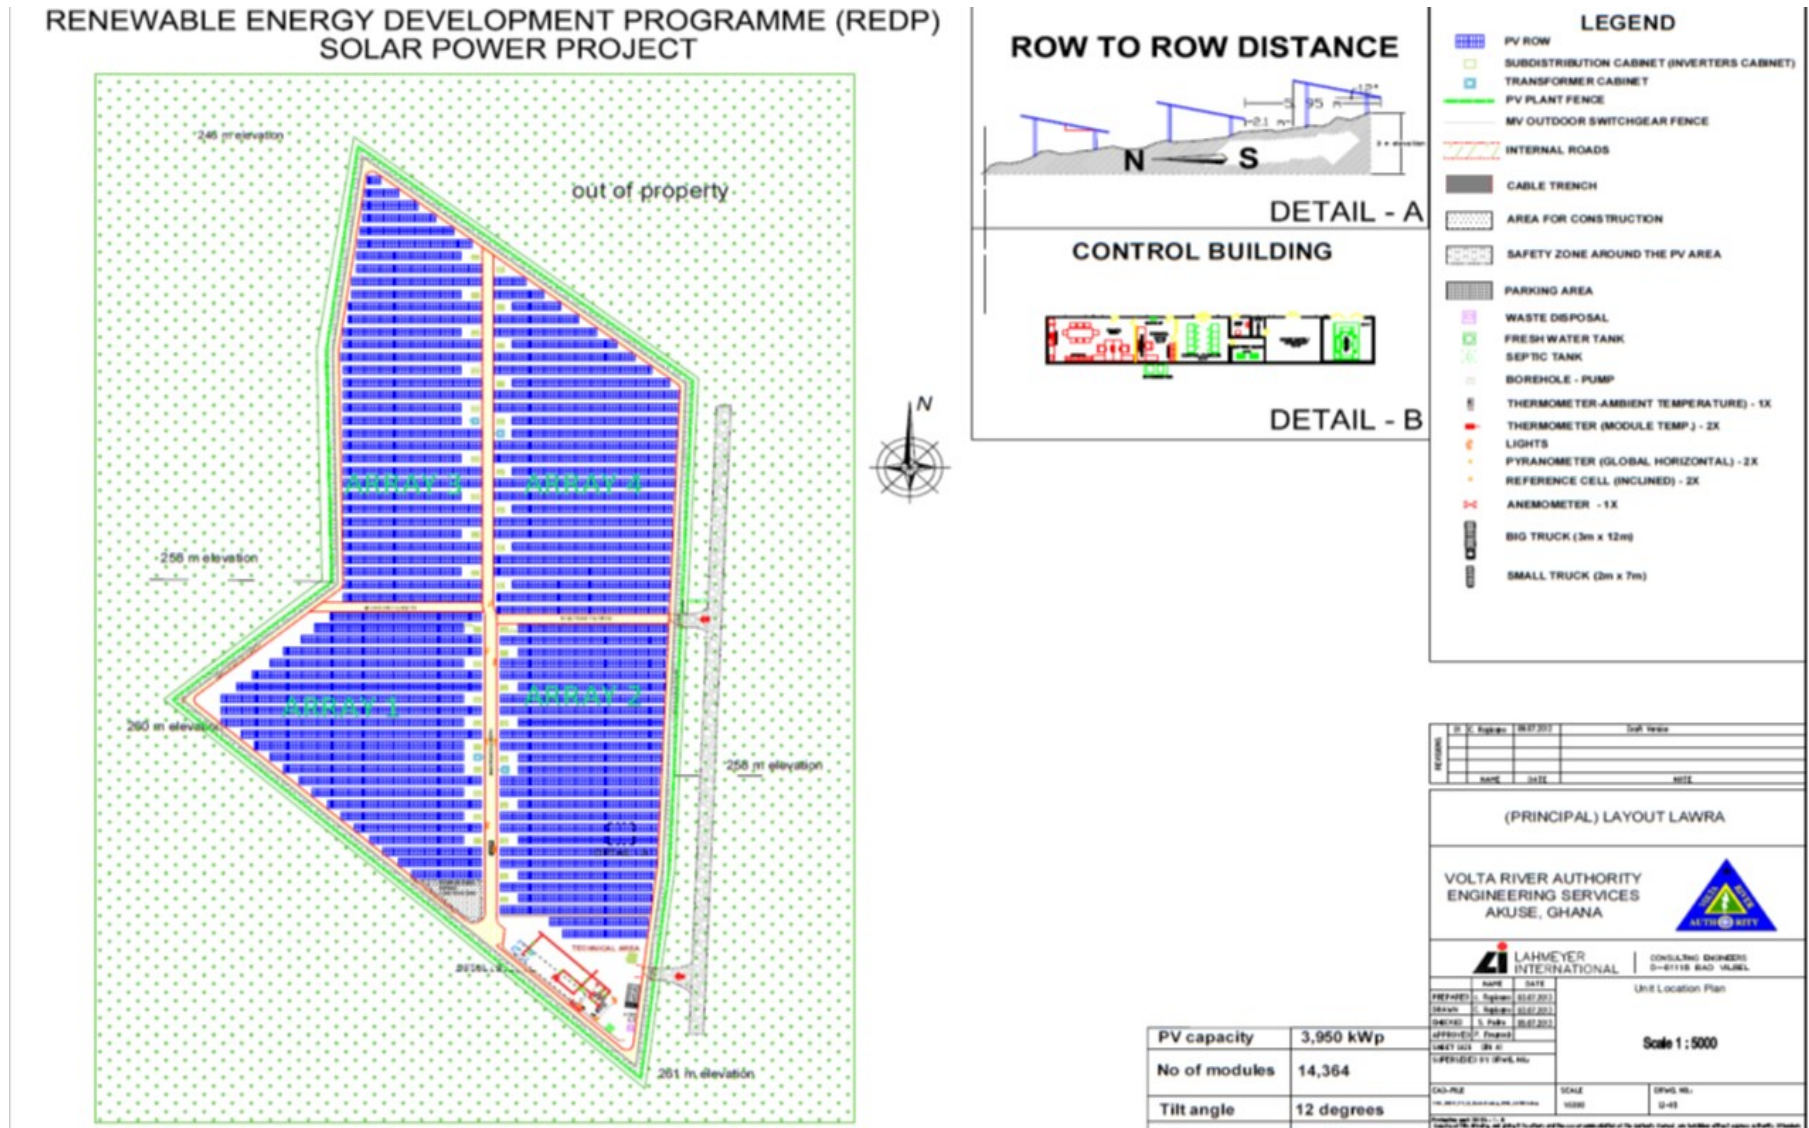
Design Drawing Showing Civil Layout for Lawra Site
